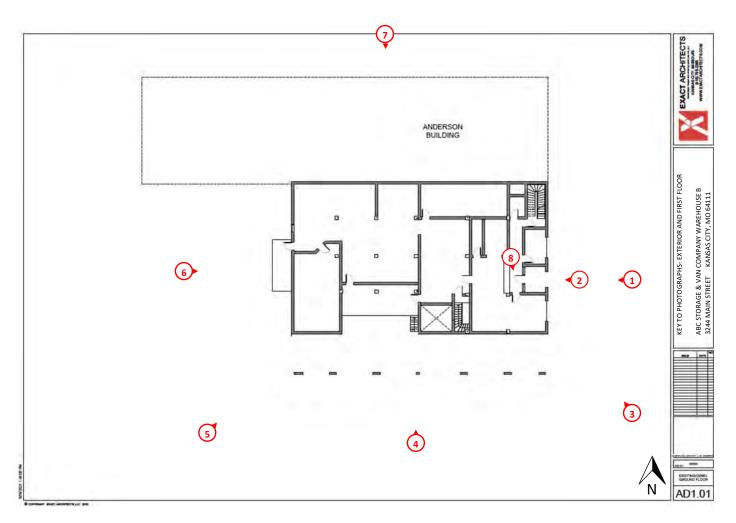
ABC Storage & Van Company Warehouse B current floor plan and key to photographs, exterior and first floor.
